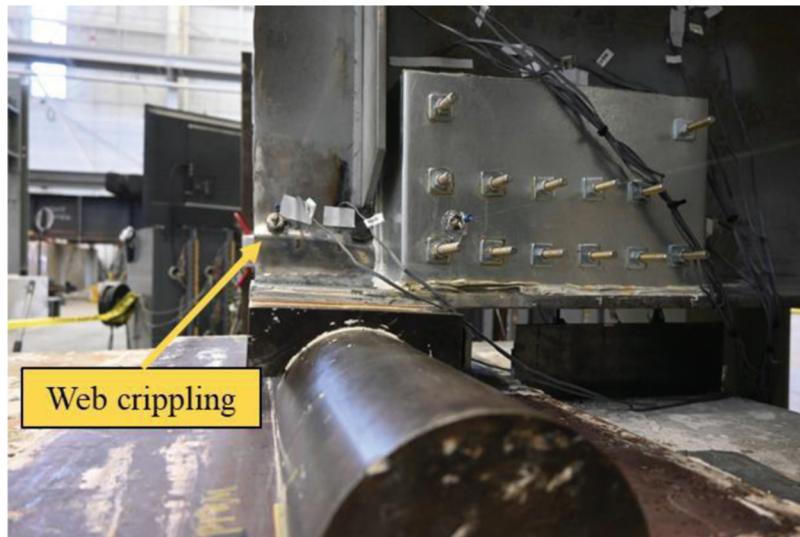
Specimen 3: deformed shape, view from the west side.
